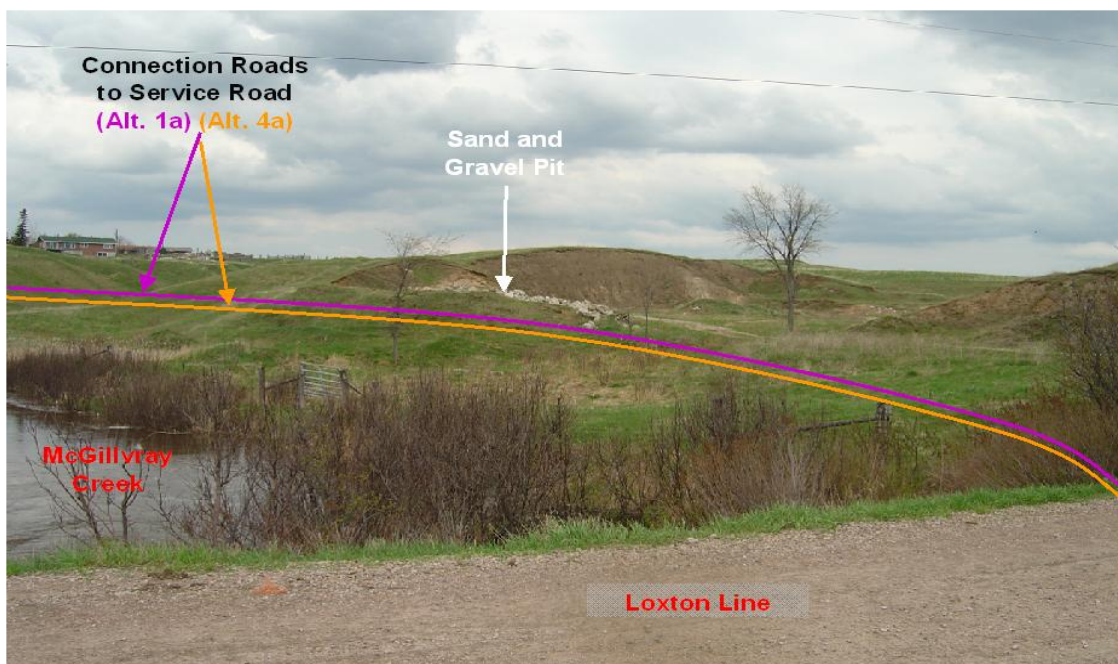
View looking south east from south side of Loxton Line at 30 m east of Highway 11 NBL at extensive erosion of bank in hilly terrain environment. (May 8, 2007)
